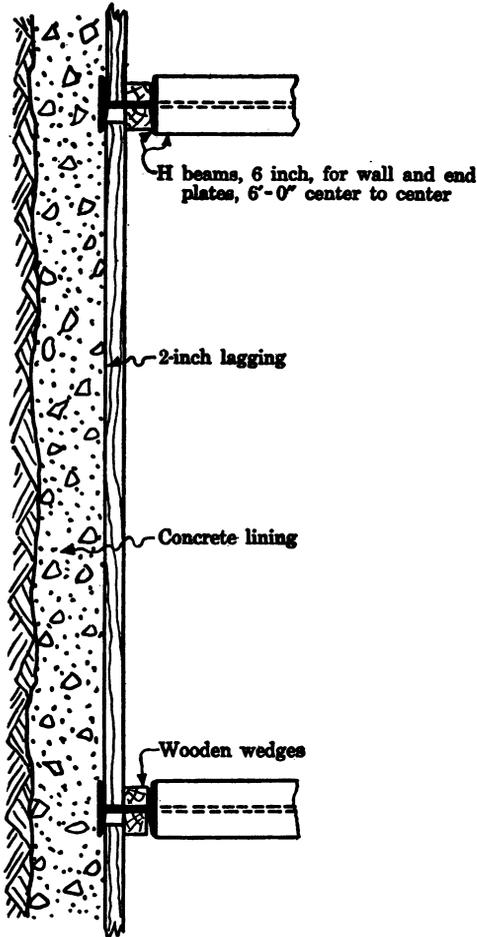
Combination of concrete and steel sets for shaft lining
